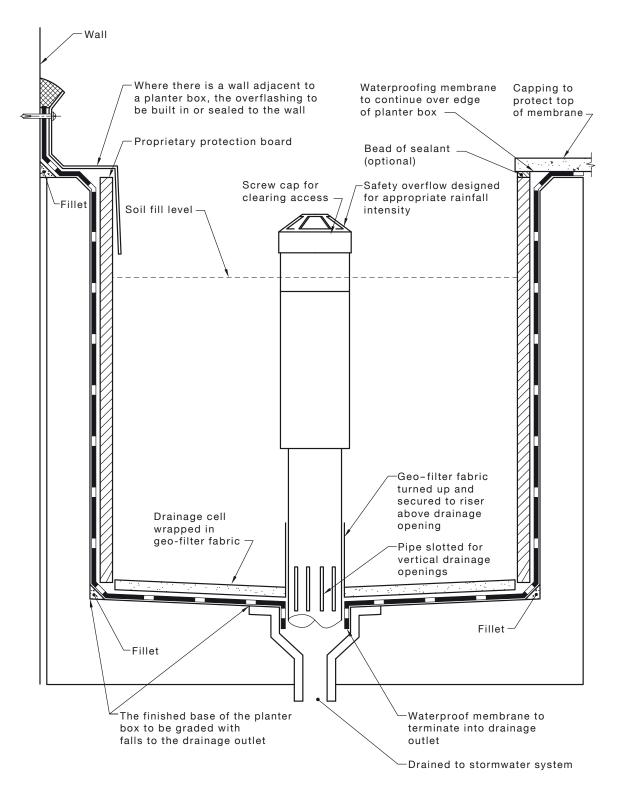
TYPICAL PLANTER BOX CONSTRUCTION
